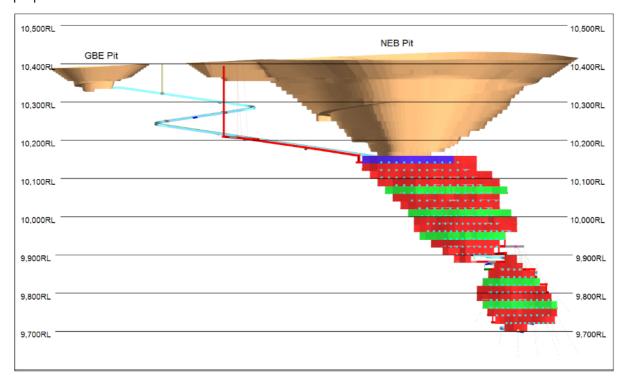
Access to Underground from the GBE Open Pit Looking East
